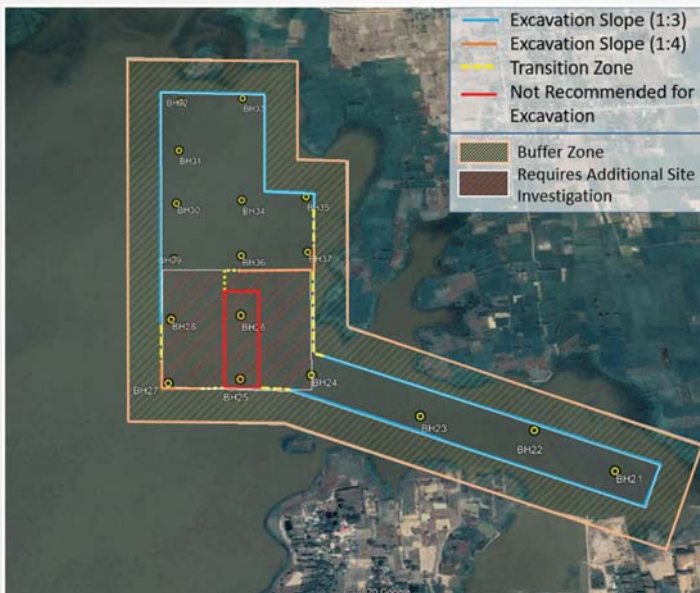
Plan view showing the proposed excavation slope and buffer Zone
